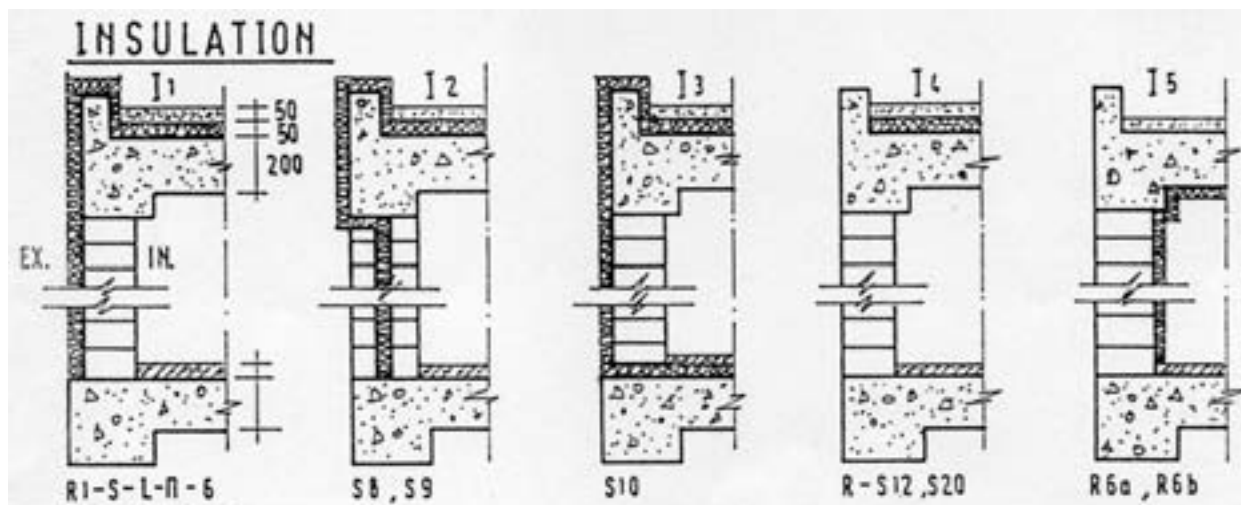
Details of insulation application on the roof, walls and floors, externally, sandwiched and internally
